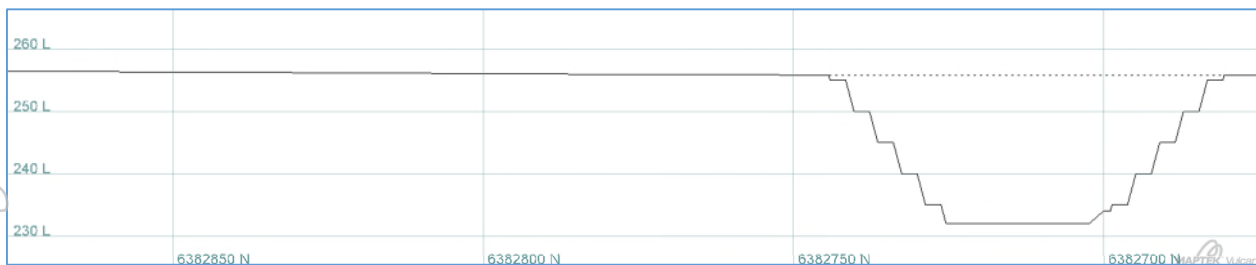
provides an example of the planned progression of the first two planned strips in cross section as mining advances to backfill of the plant residue encased in a clay seal as a residue storage facility (RSF).
